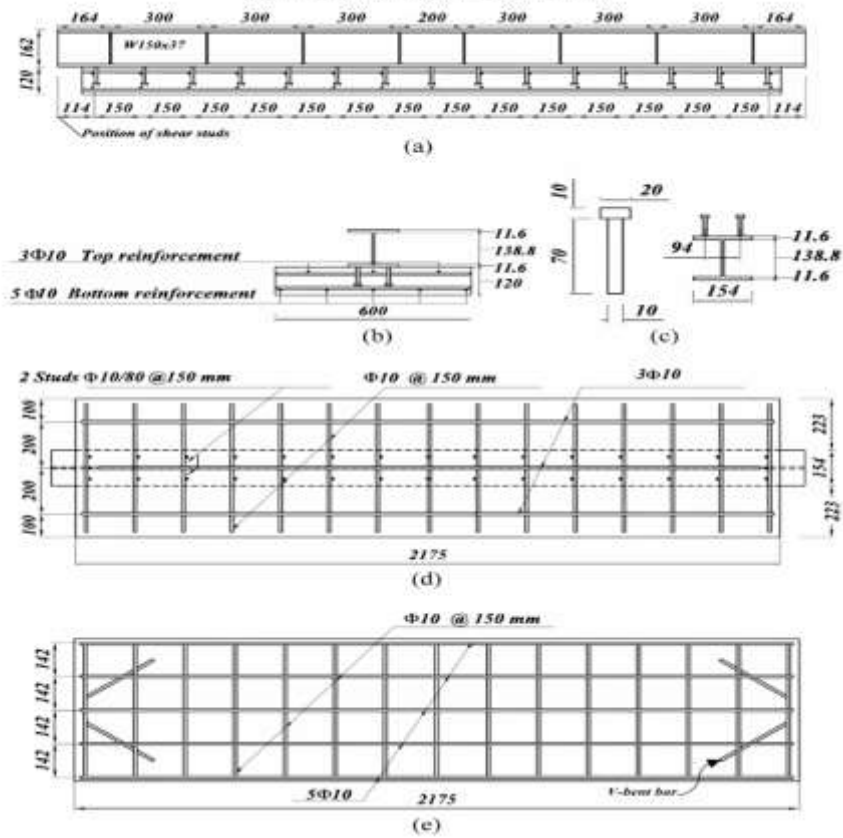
Details of the Continuous Composite Girders, (a) Girder Longitudinal Section, (b) Front View Cross Section, (c) Shear Connector (d) & (e) Reinforcement Bars Distribution [41].
